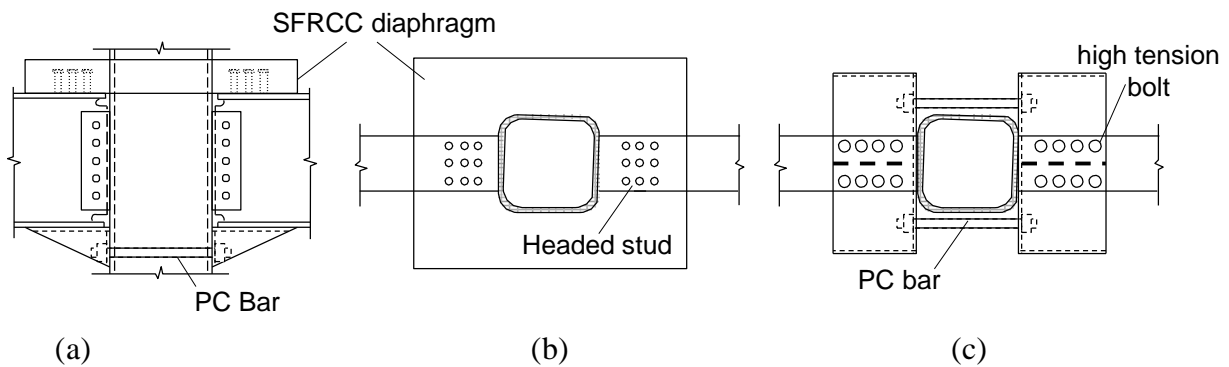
Proposed beam-to-column connection with floor slab functioning as exterior diaphragm:
